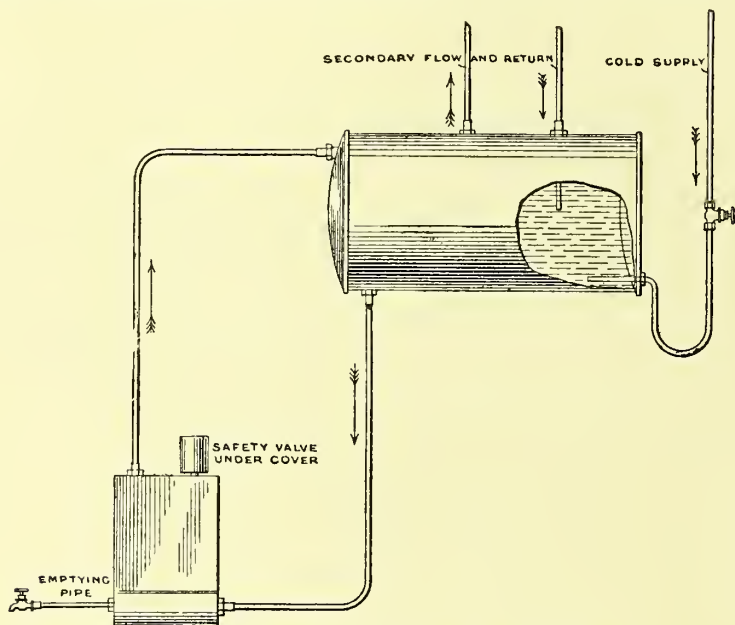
Arrangement of Pipes for Cylinder Fixed Horizontally
